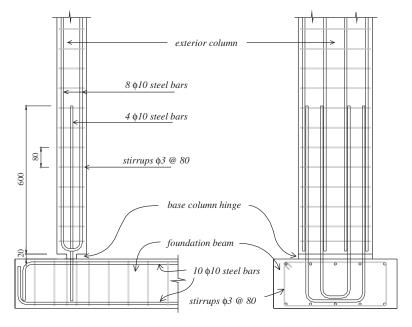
Reinforcing detailing at the base of exterior columns.
